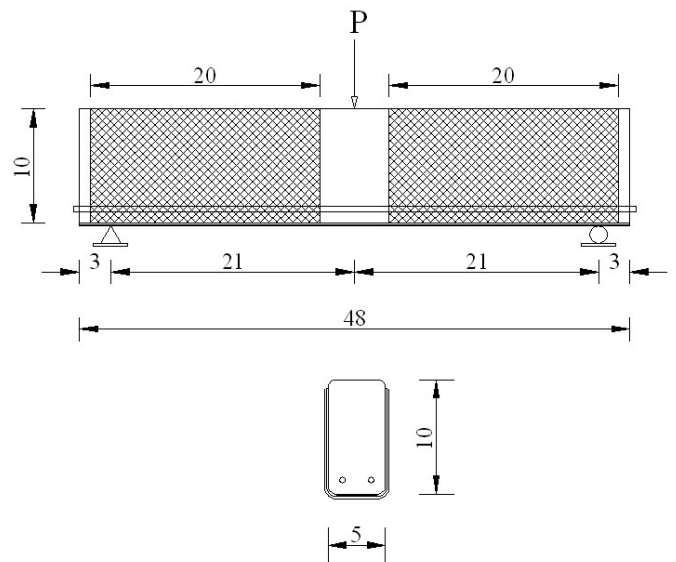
Test setup and typical dimensions: (a) elevation; (b) cross section showing shear and flexure reinforcement. All dimensions in inches.
